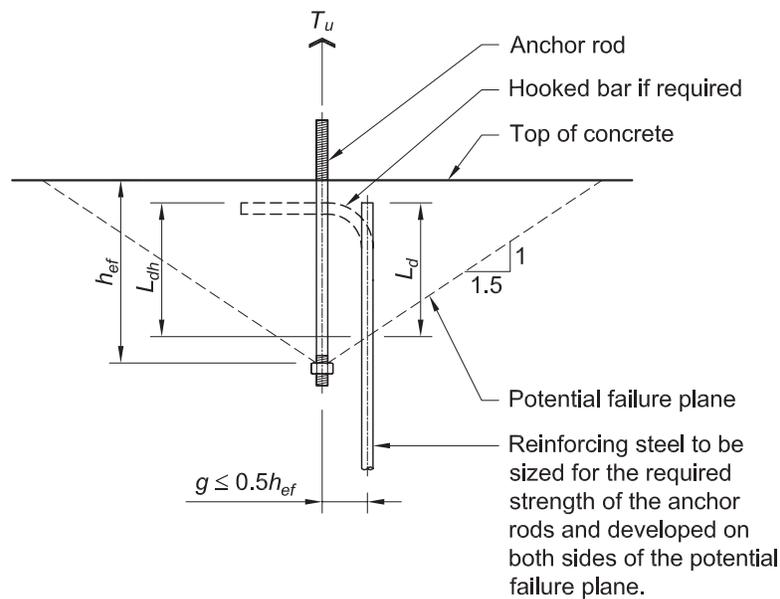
The use of steel reinforcement for restraining tension concrete breakout.
